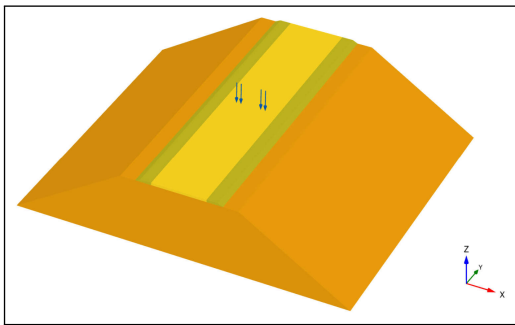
Geometric model of 175 mm pavement section in PLAXIS 3D
